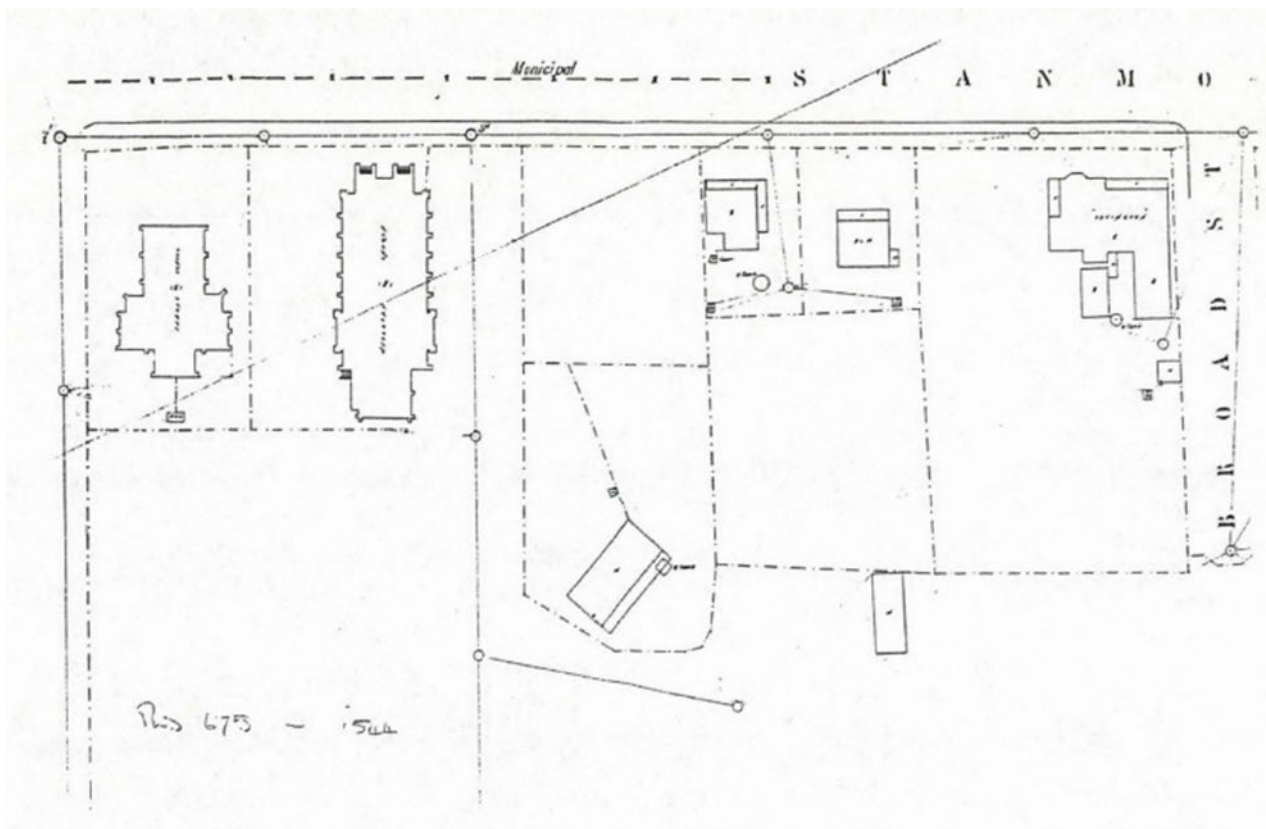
Plan of the subject site in 1890. Note the expansion of Sevington and construction of new outbuildings to the east of Jones' cottage.
